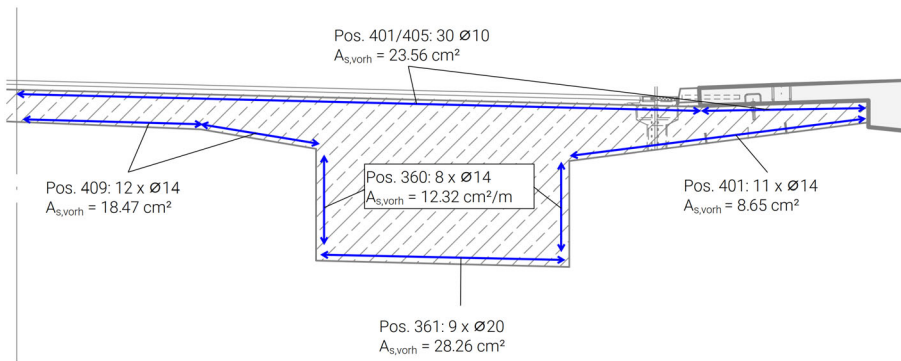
Existing longitudinal reinforcement—section bridge axis/t-beam;  $A_{s,vorh}$ —planned cross-sectional steel area.
